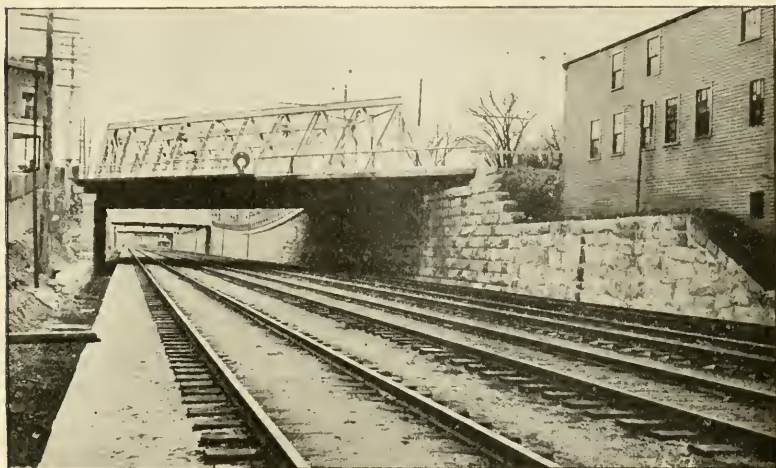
FINISHED WORK FROM WASHINGTON STREET, WEST NEWTON, TO WEST NEWTON STATION.
